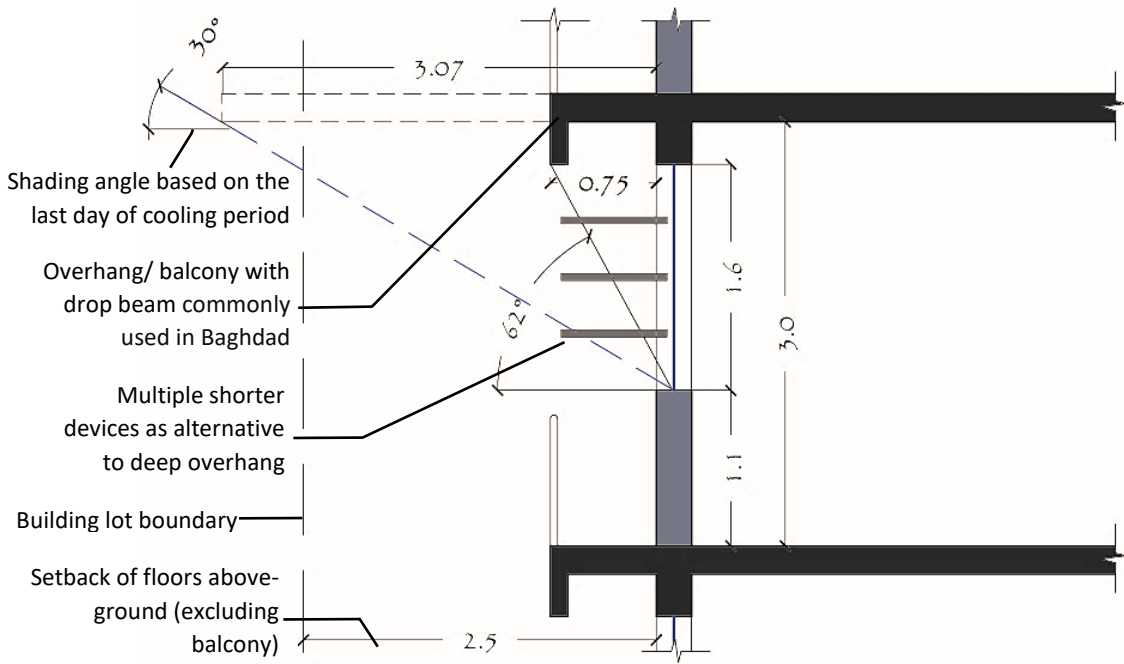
Section through a typical room in commercial buildings in Baghdad
